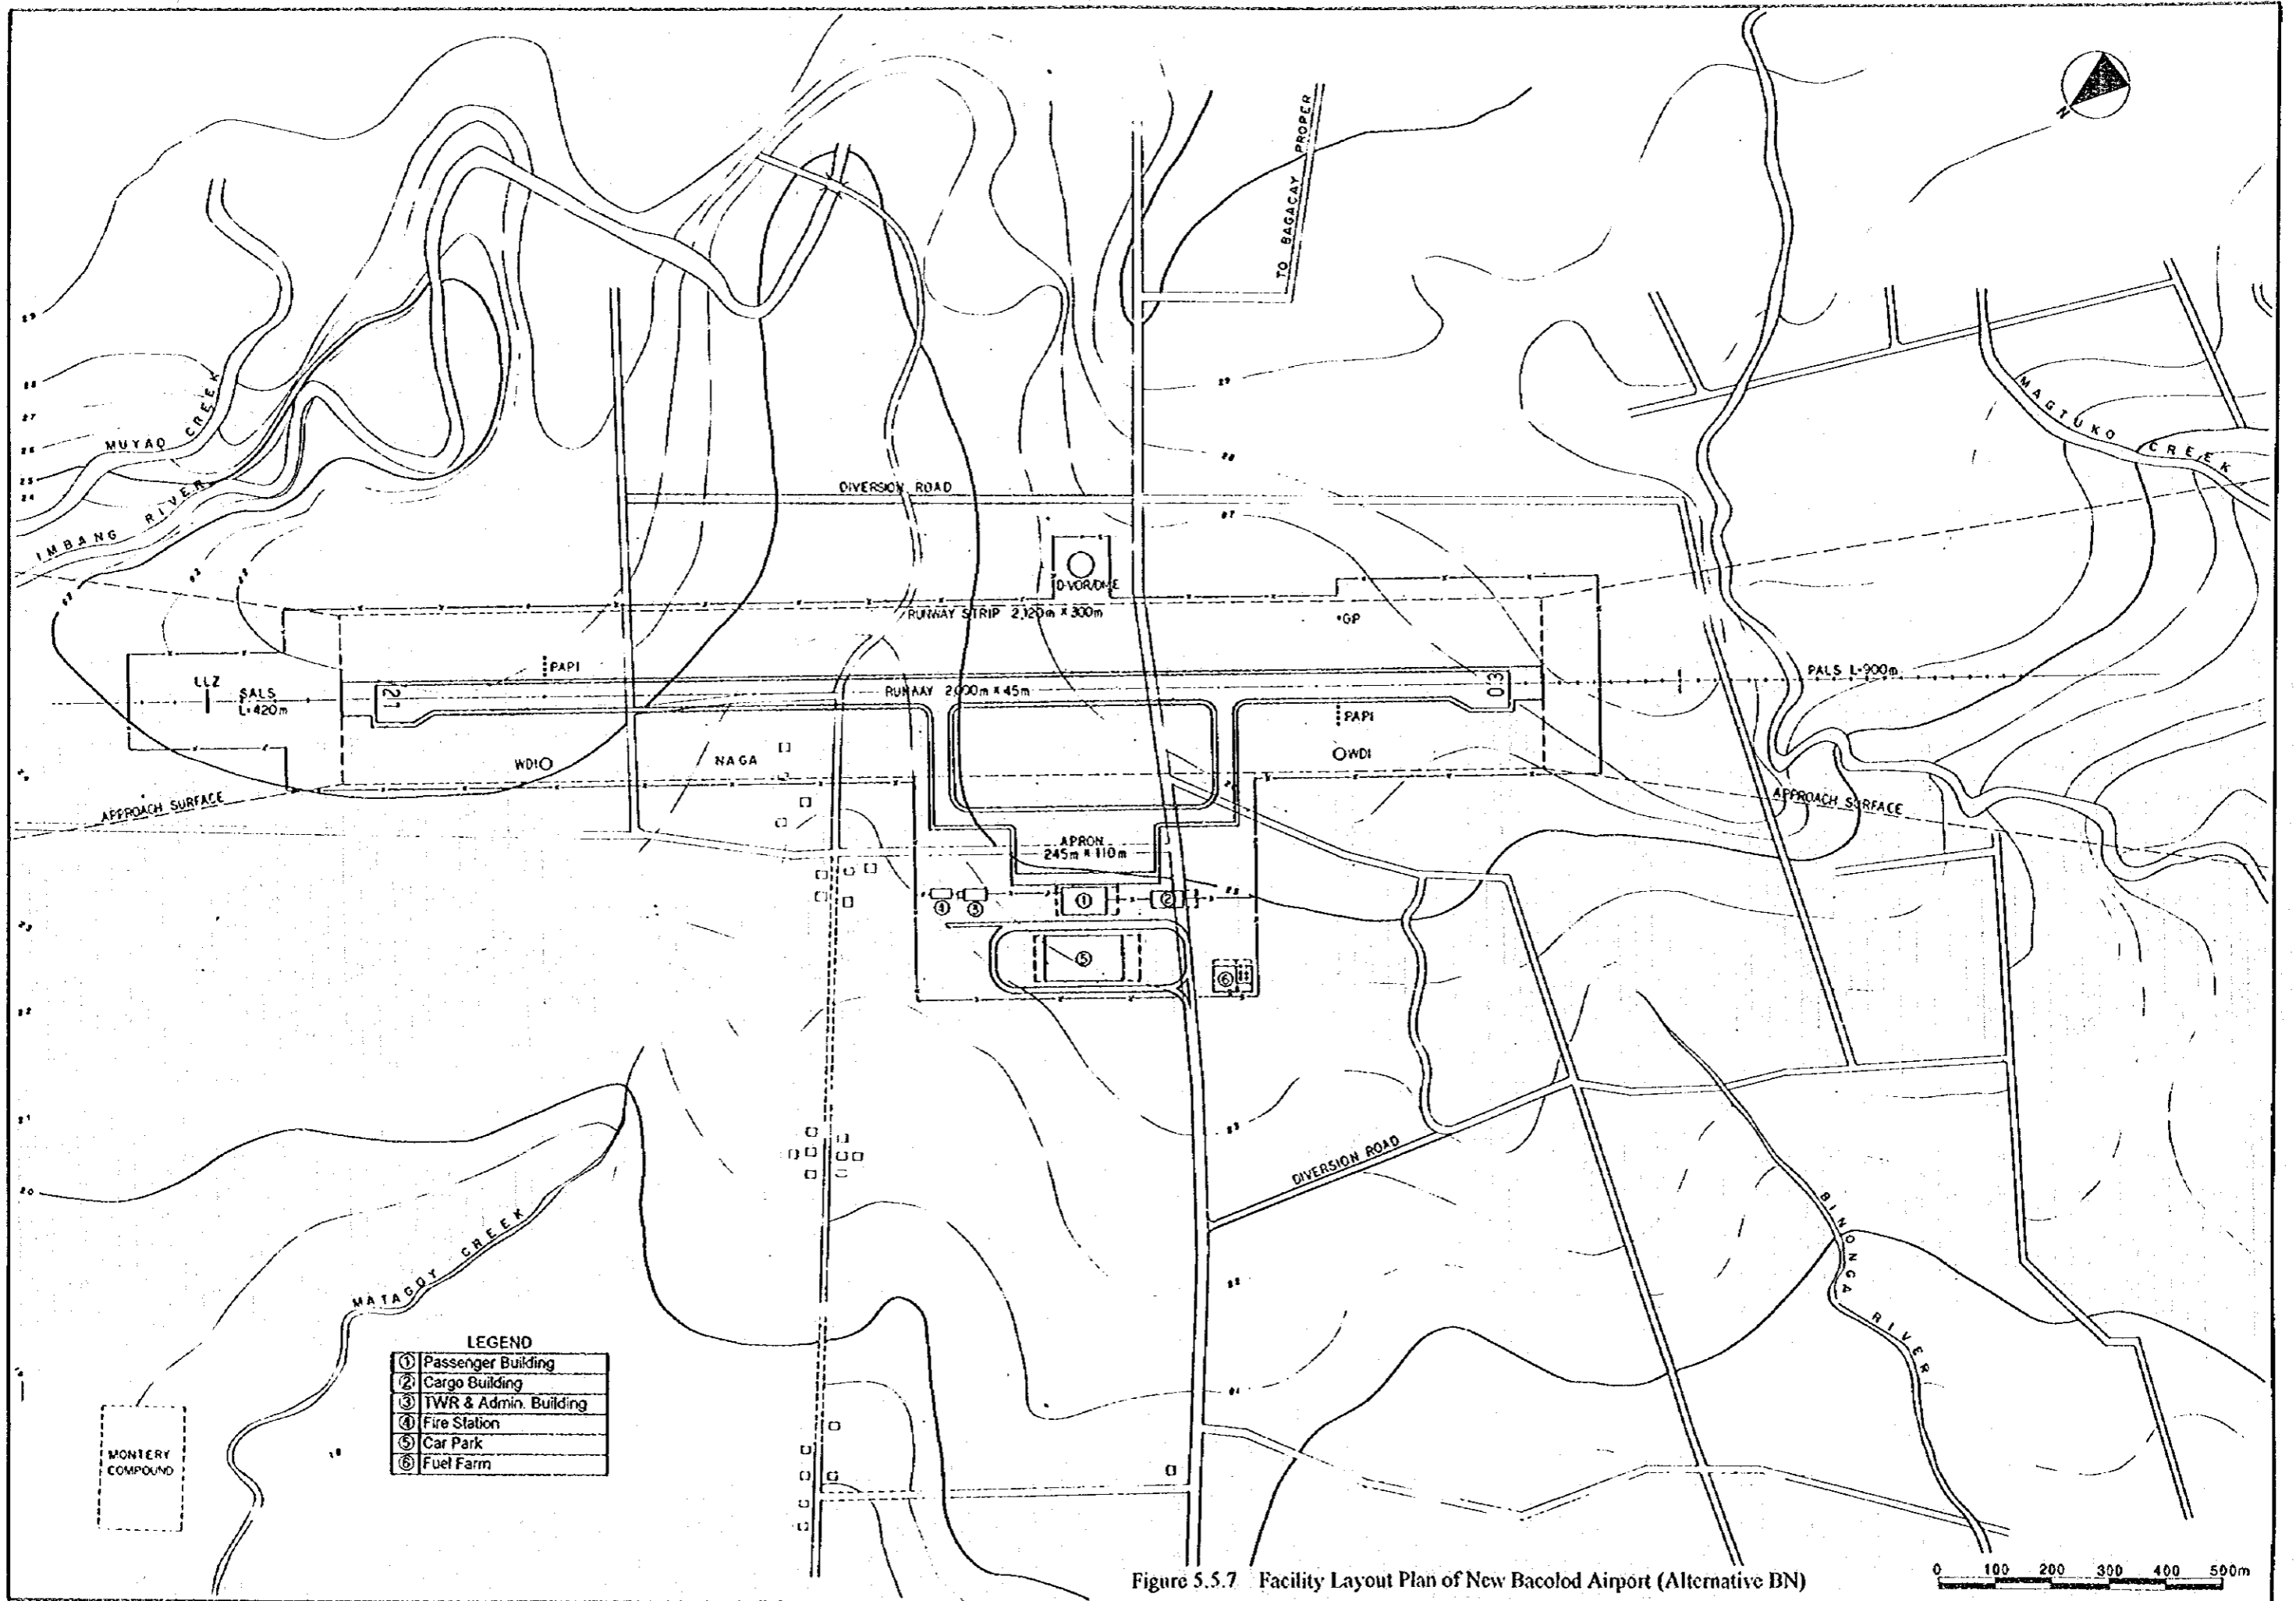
Facility Layout Plan of New Bacolod Airport (Alternative BN)
